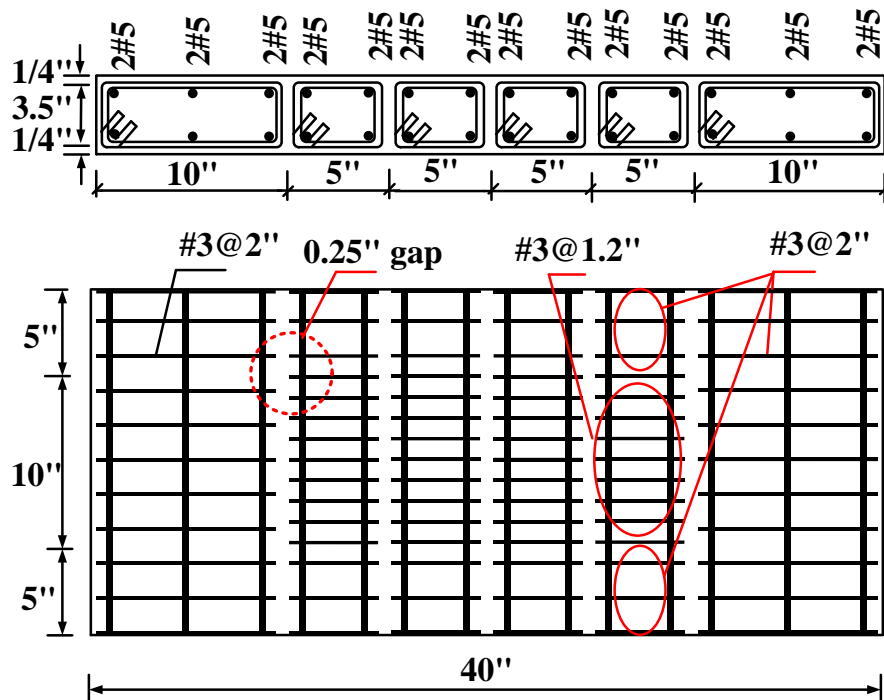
Top and side views of shear wall reinforcement for SW-HP-0.5-1.
